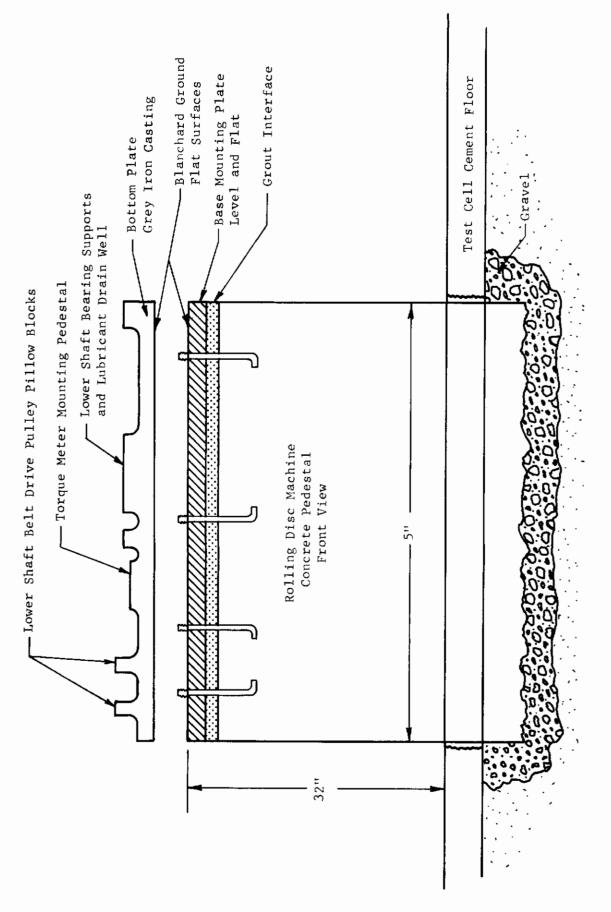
Front View of Rolling Disc Machine Base Pedestal Assembly
